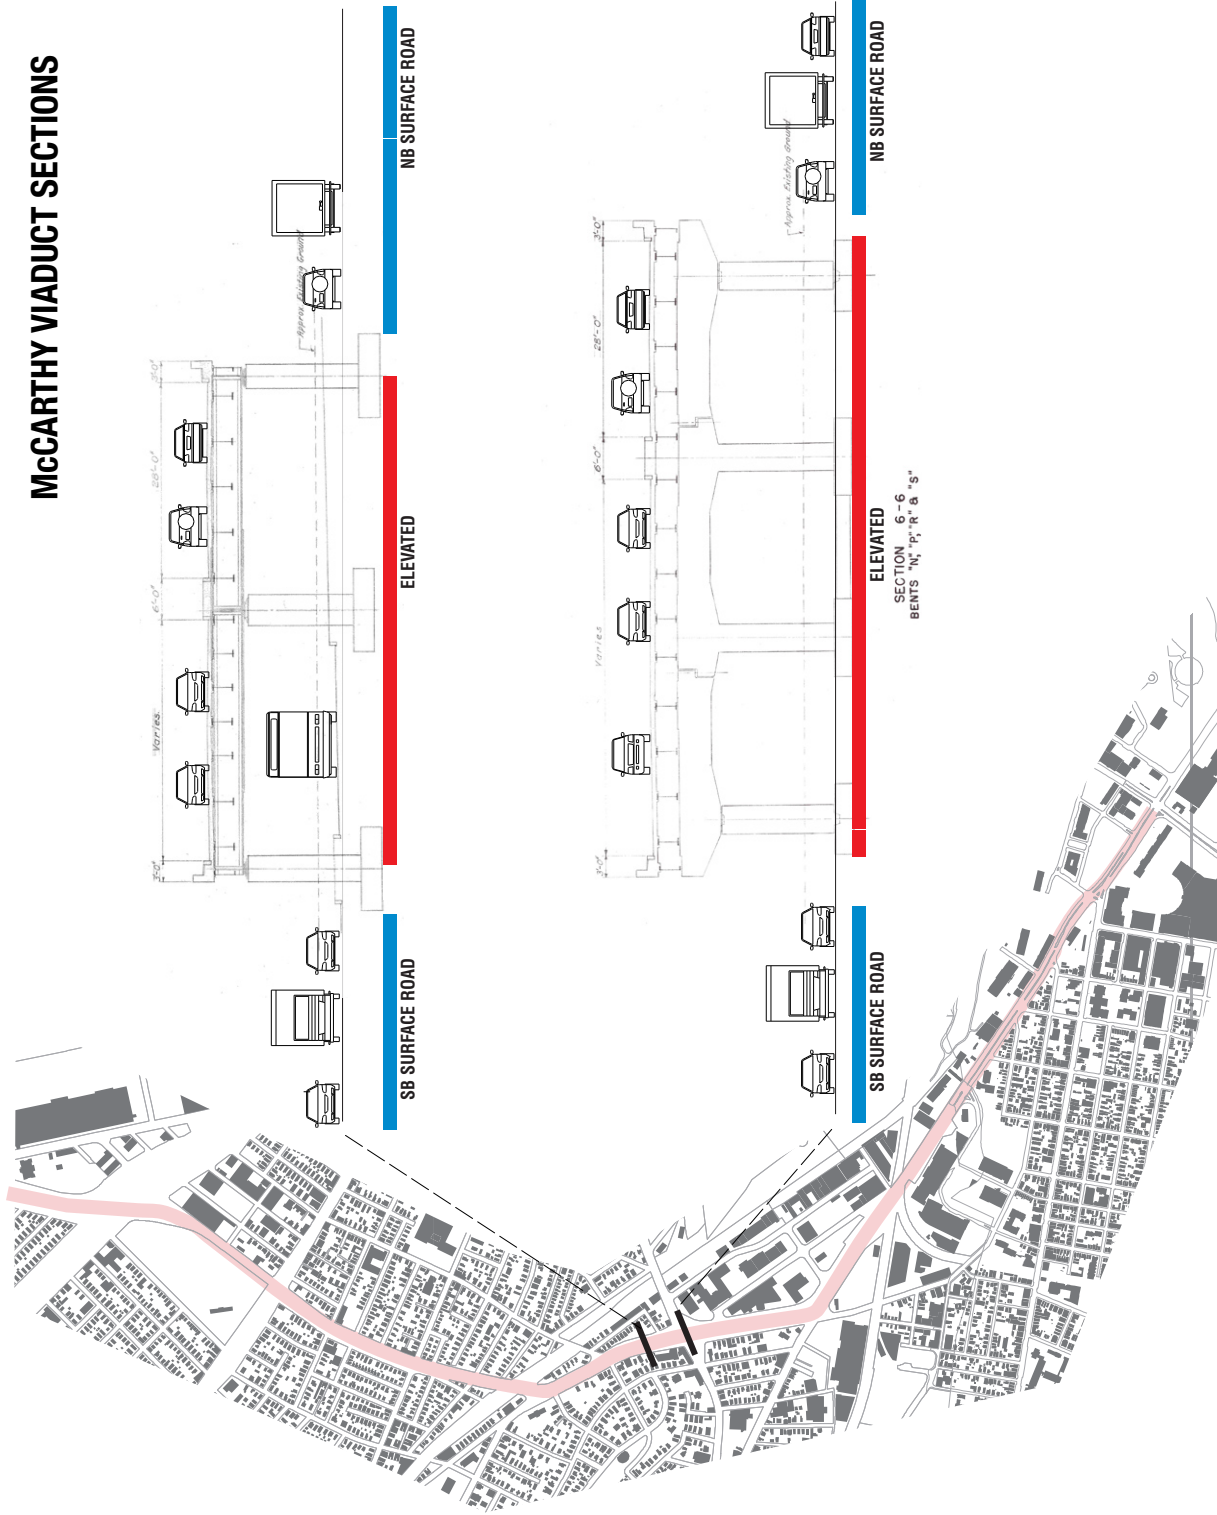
Sections of the McGrath Highway north of Washington St and at Washington St
